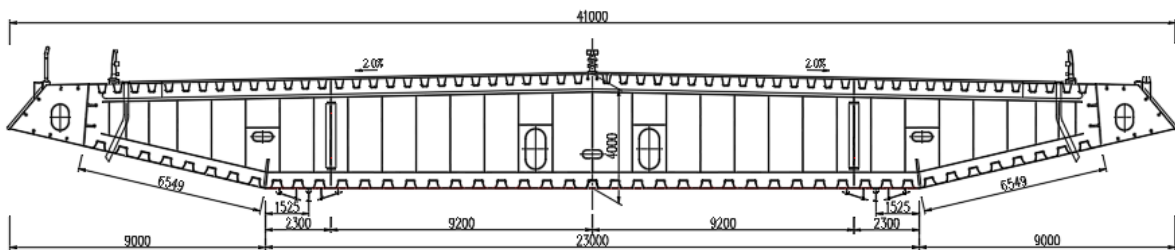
Cross section of the Sutong Bridge (Units: mm)
